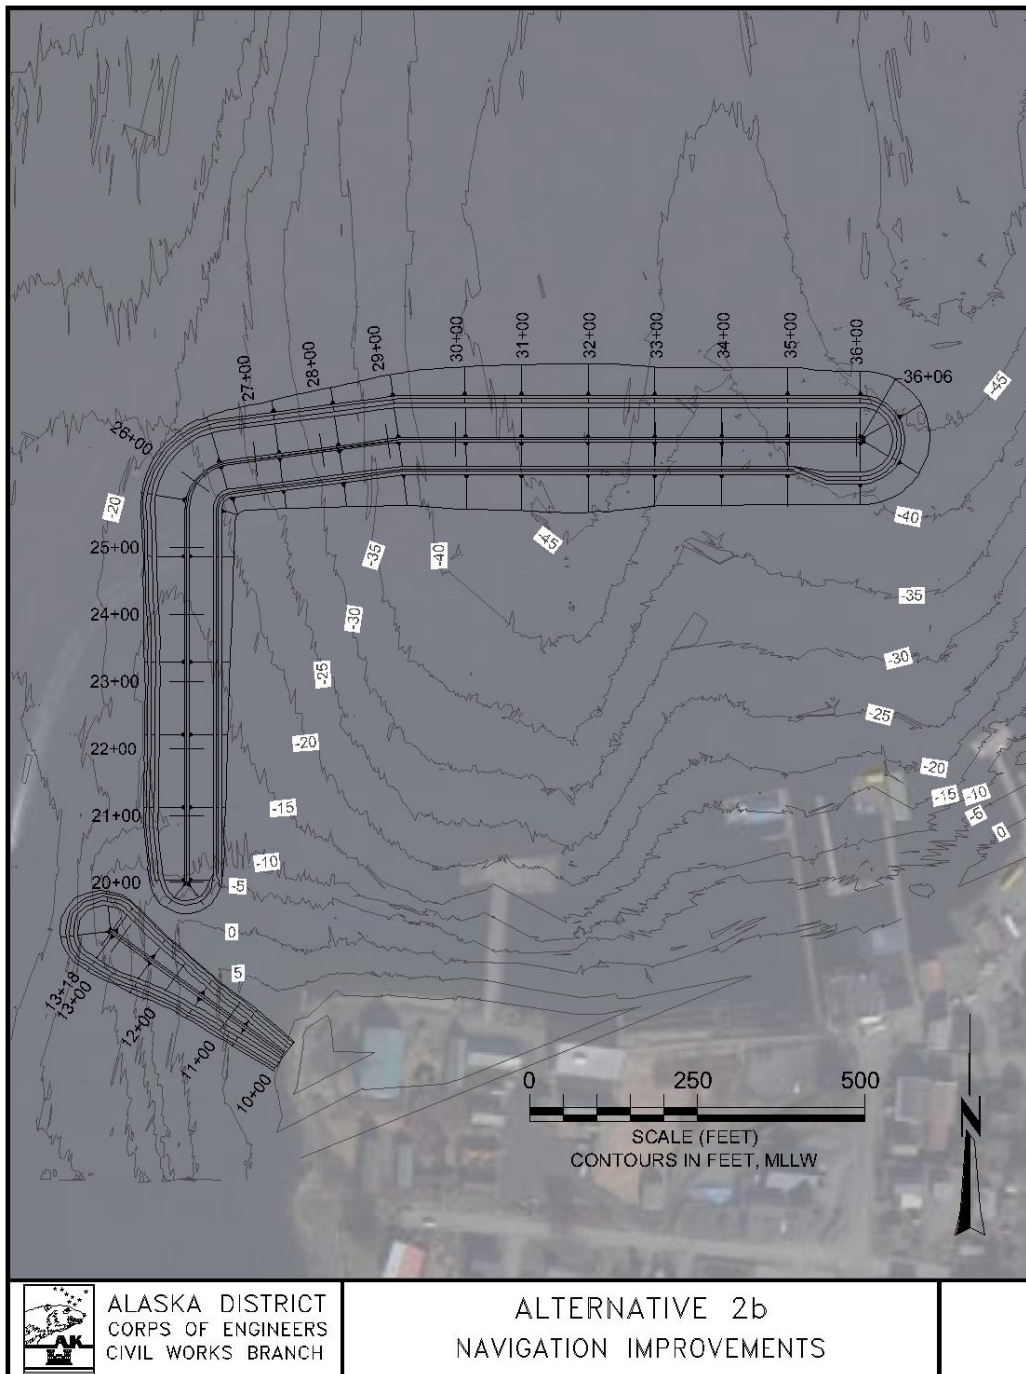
Layout of Alternative 2b, the Tentatively Selected Plan.
